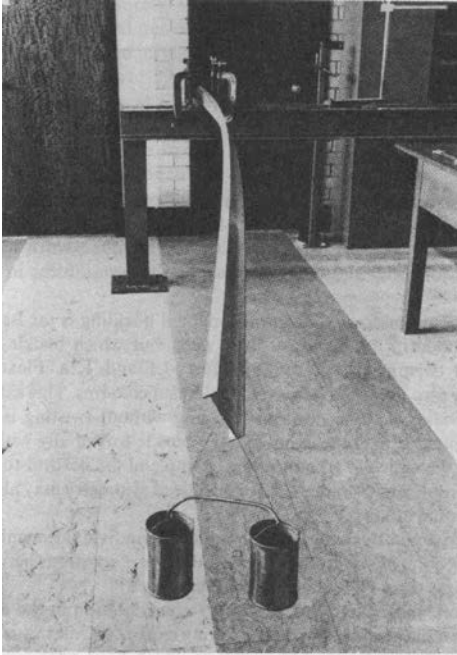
Lateral buckling of a doubly-symmetric I-section cantilever [35]
